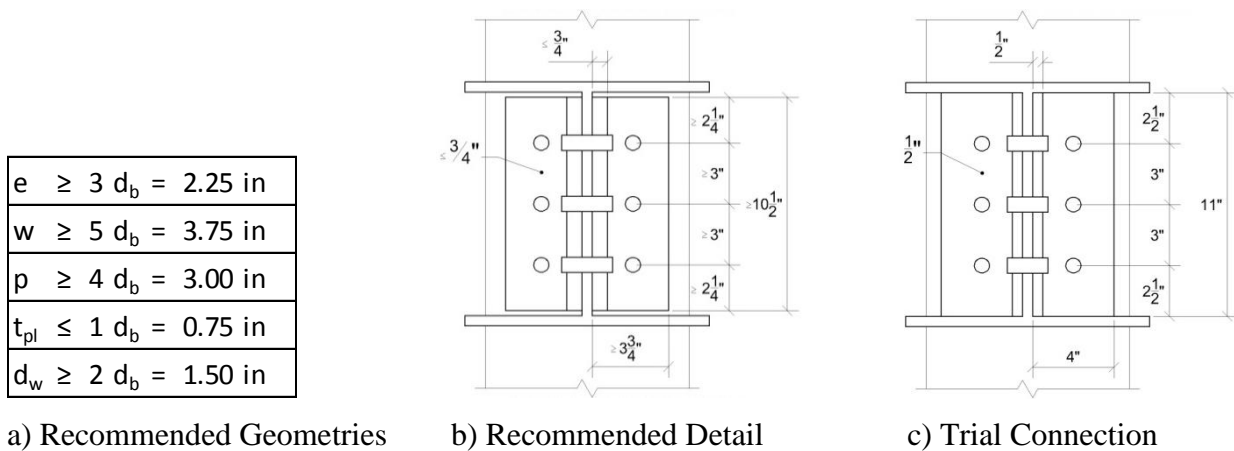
FRP Beam to Column Recommended Connection Geometries
